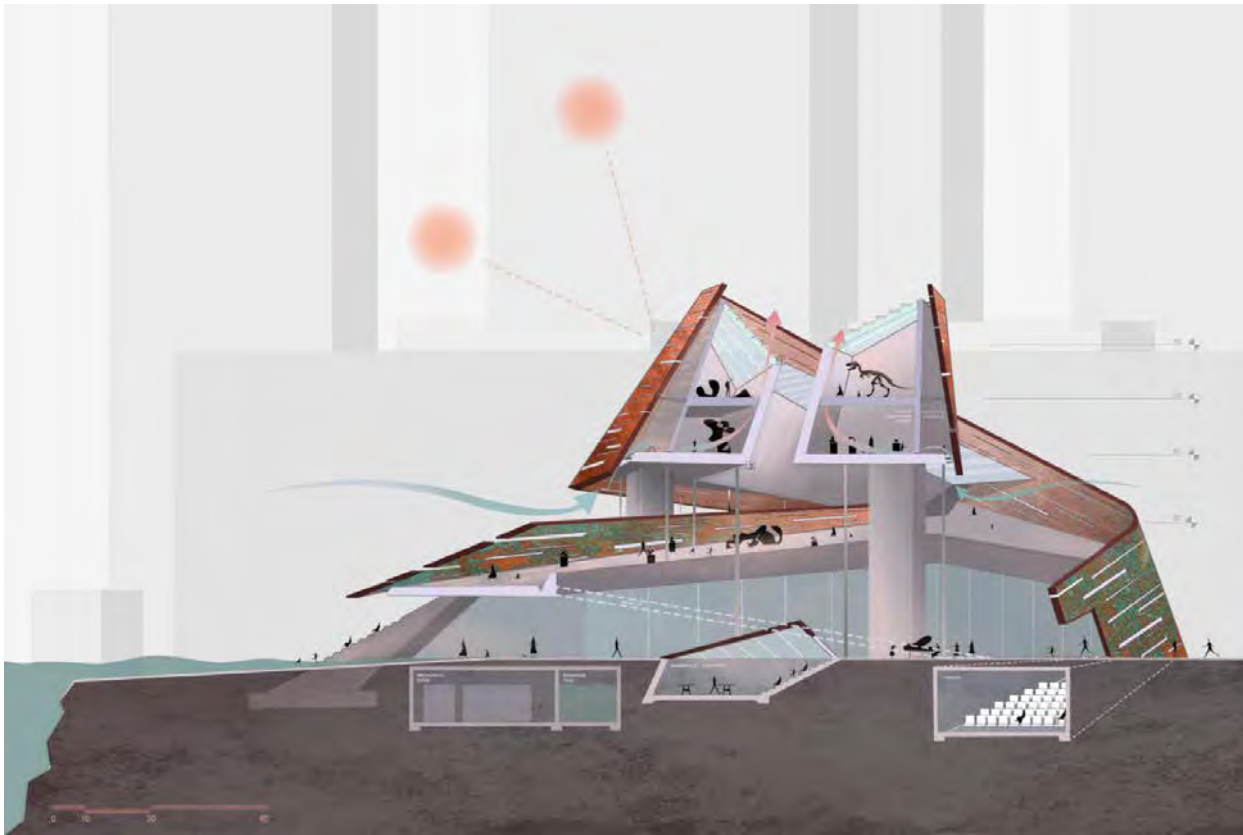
Center for Climate Change Building and Site Section Drawing. Source: (Cal Poly, 2020)
